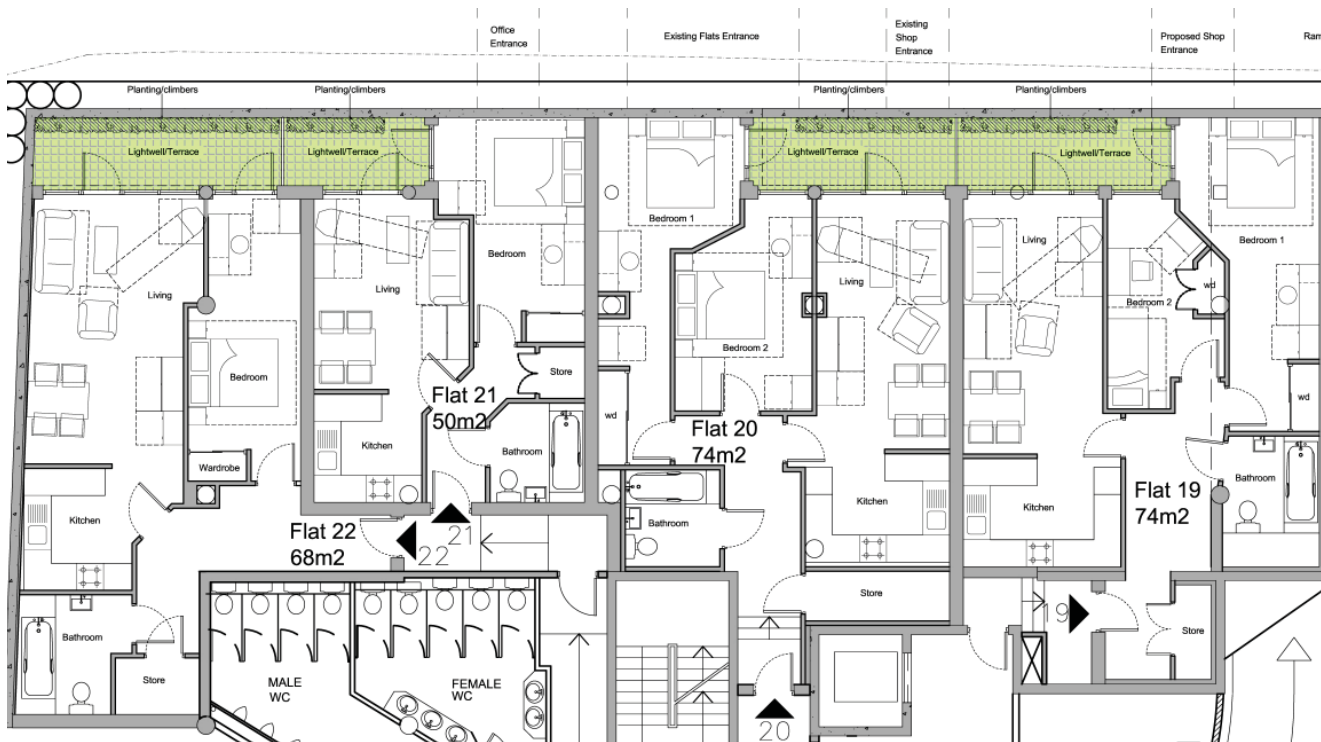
Holmes Road proposed upper basement plan showing lightwell / terraces
